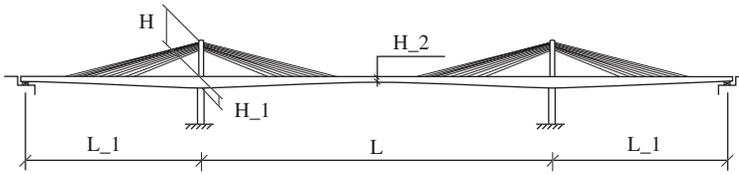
Typical Extradosed Bridge and its geometric properties
